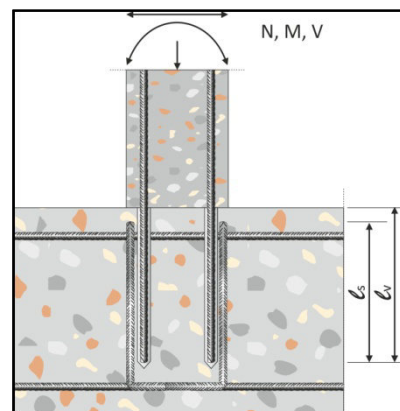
Overlap joint at a foundation of a column or wall where the rebar is stressed in tension
